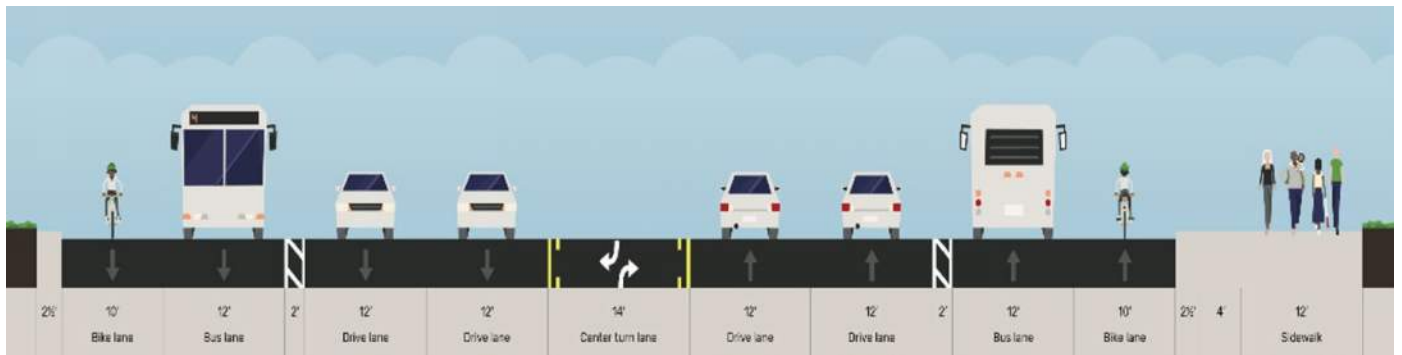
Proposed SR 224 BRT Roadway Cross-Section
